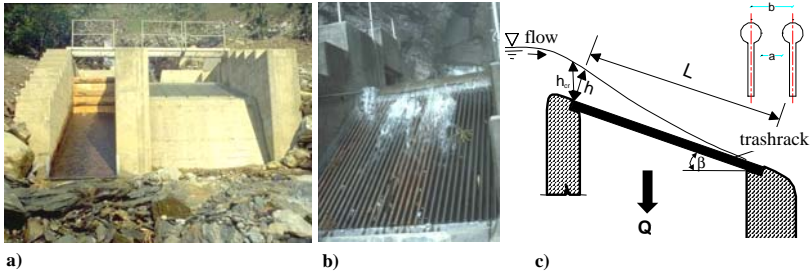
a) Tyrolean intake structure; b) Trashrack; c) Typical profile with trashrack section
